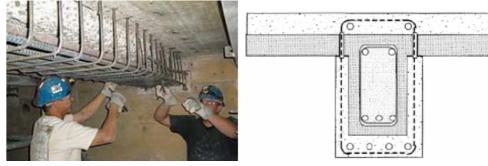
addition of steel reinforcement and concrete overlay [17] b) Internally placed reinforcement: It is common in bridges.
